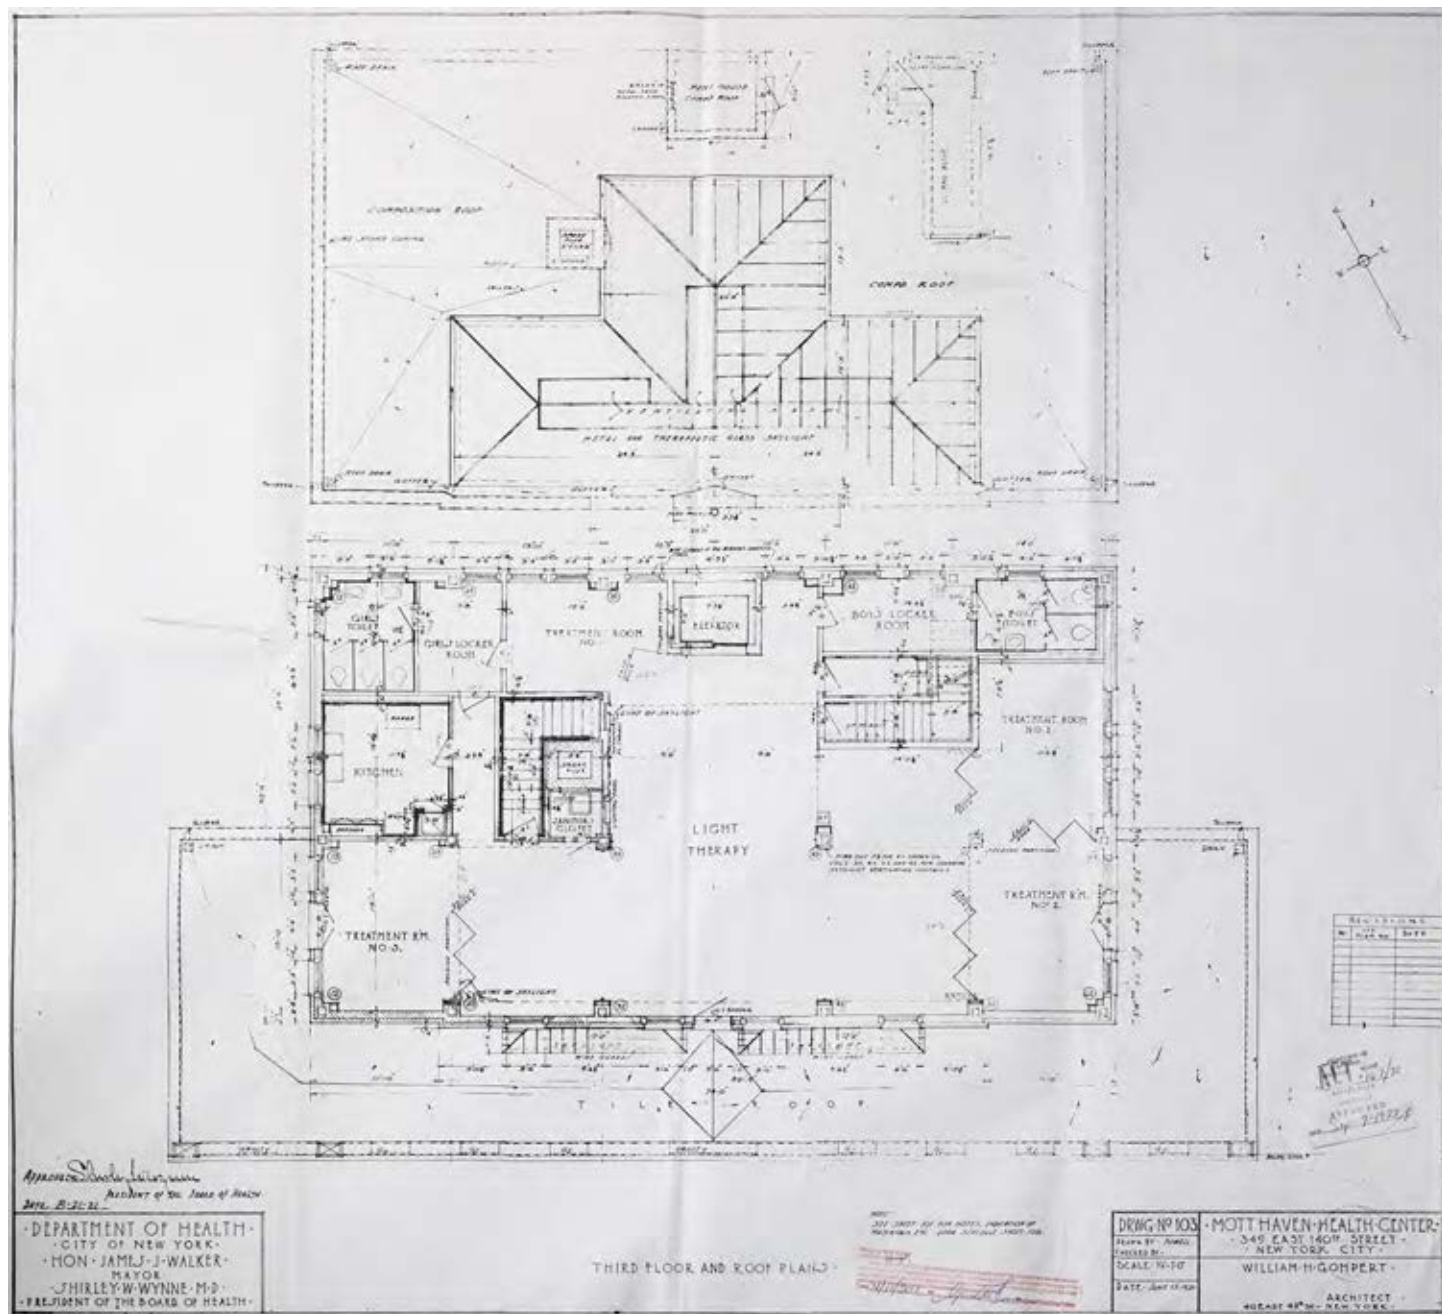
1931 third floor and roof plan showing the light therapy room and rooftop skylight.
